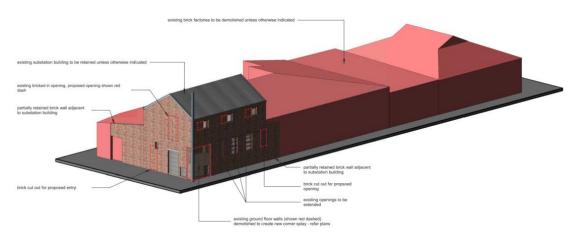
General extent of demolition proposed (exclusive of proposed demolition of roof, doors and windows to former bakehouse building).
